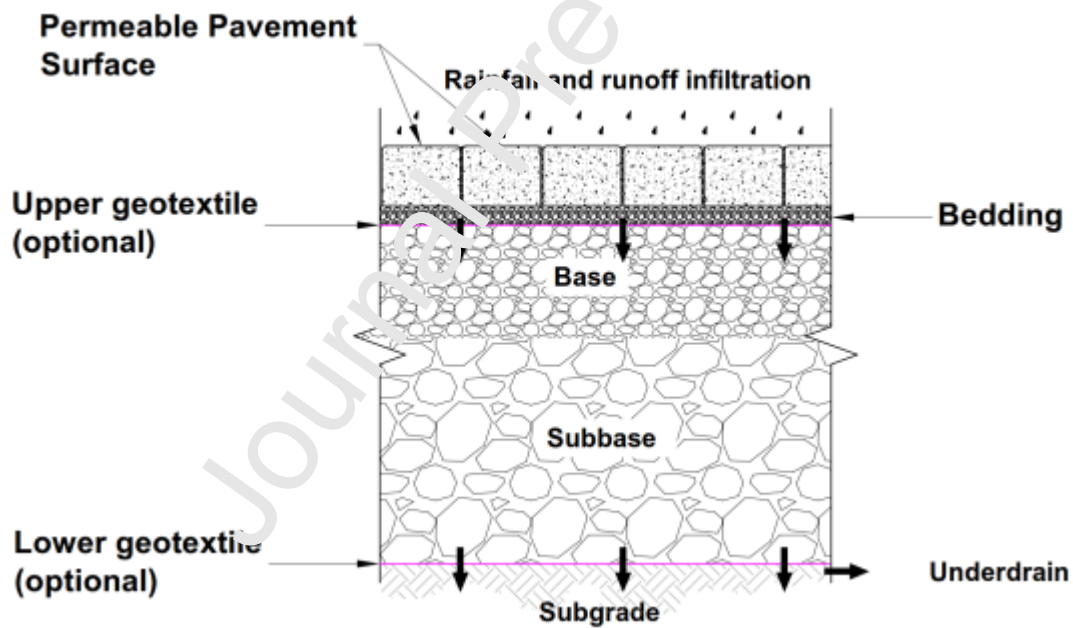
Section through detailing the build-ups in a Pervious Pavement System (Tota-Maharaj, et al., 2017)
